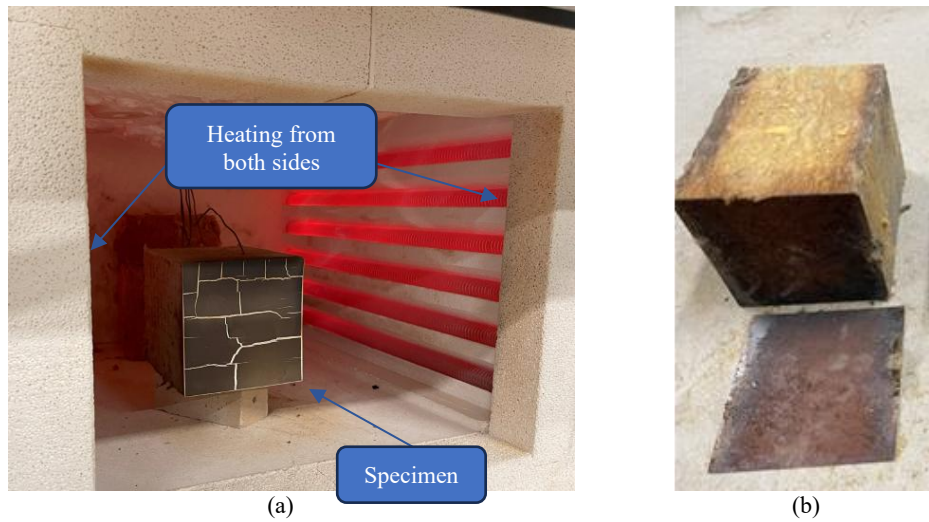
Sandwich panel sample tested up to 250°C: (a) specimen placed in a furnace with bilateral heating configuration; (b) failure mode showing delamination between facing and core material after thermal exposure.
